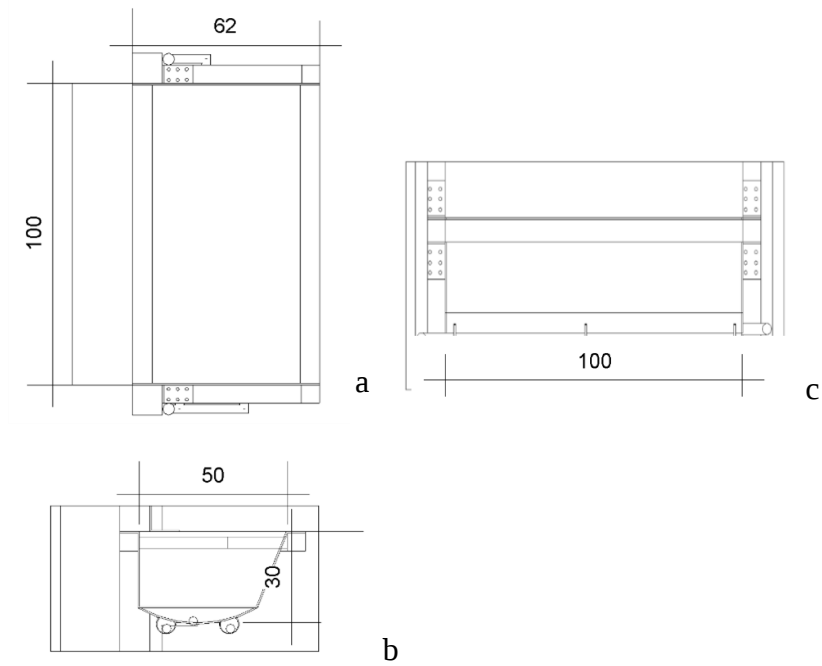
Views of the module a) Plan b) Elevation c) Section
